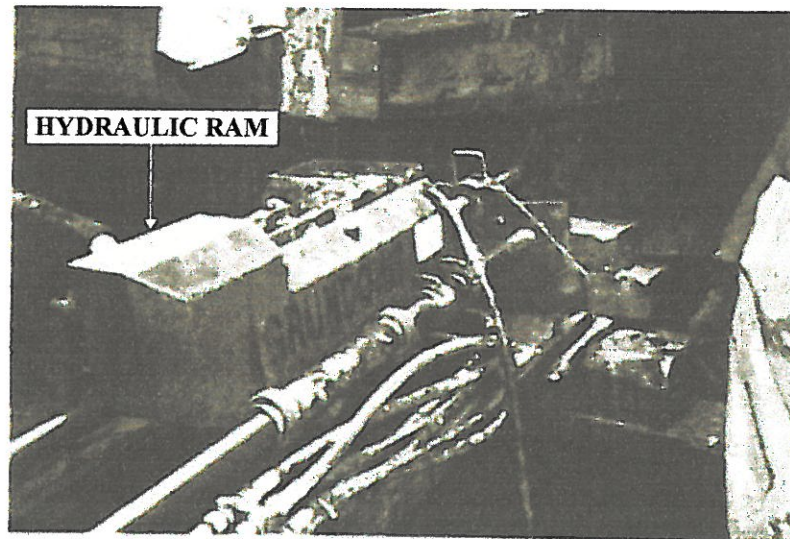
Elevation view of "Grundohit" hydraulic ram.
